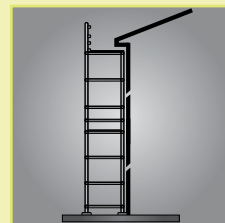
(c) Scaffold platform at edge of roof with hop-up bracket for other trades
